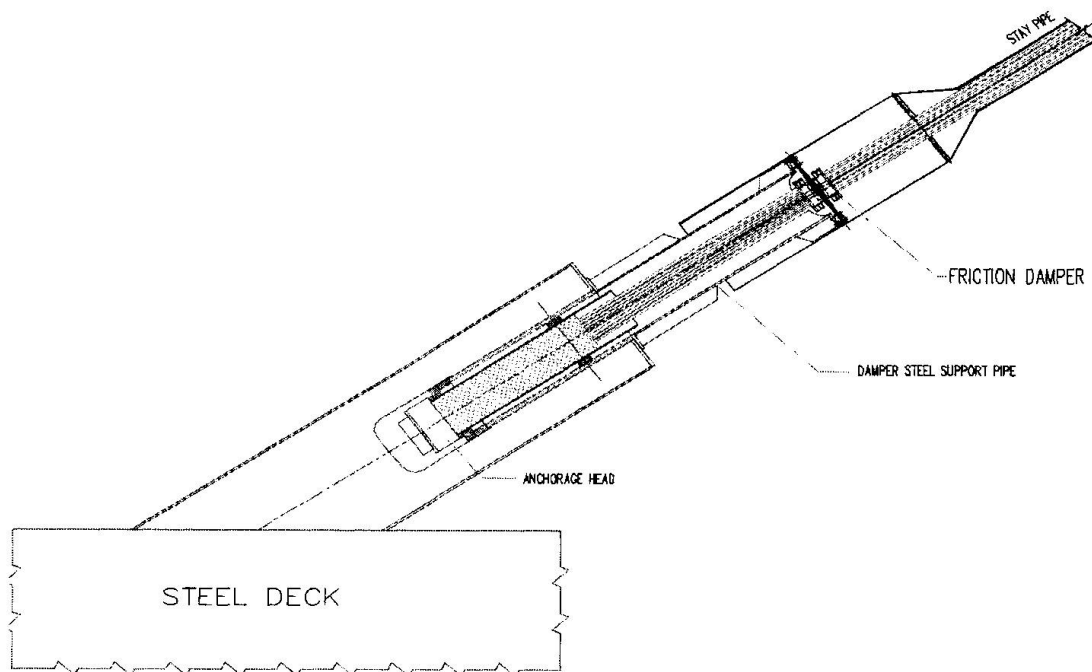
Installation of friction damper on UDDEVALLA Bridge
